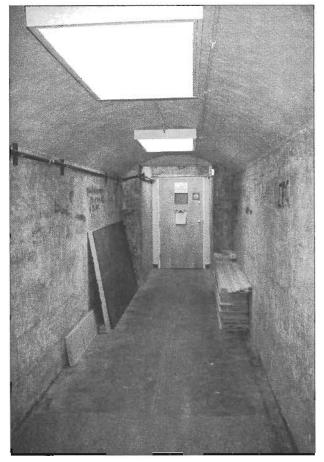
The exterior door of Building 261 leads into a concrete tunnel that has a second locked door securing entrance to the curation facility. The concrete walls have graffiti dating to 1907 that was discovered during the rehabilitation of the facility in 1992.
